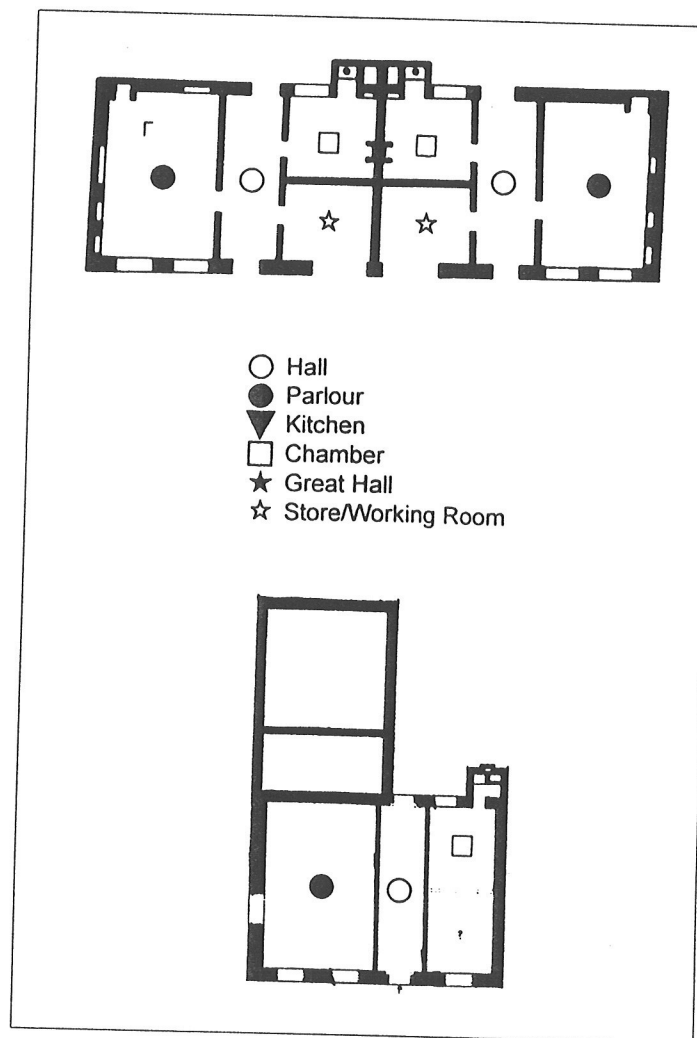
Examples of single houses and double houses with a similar layout. A: Double house, the Rosenvinge house in Malmö (after Johansson 1987). B: Single house, Stengade 66 in Helsingør (after Engqvist 1987).
